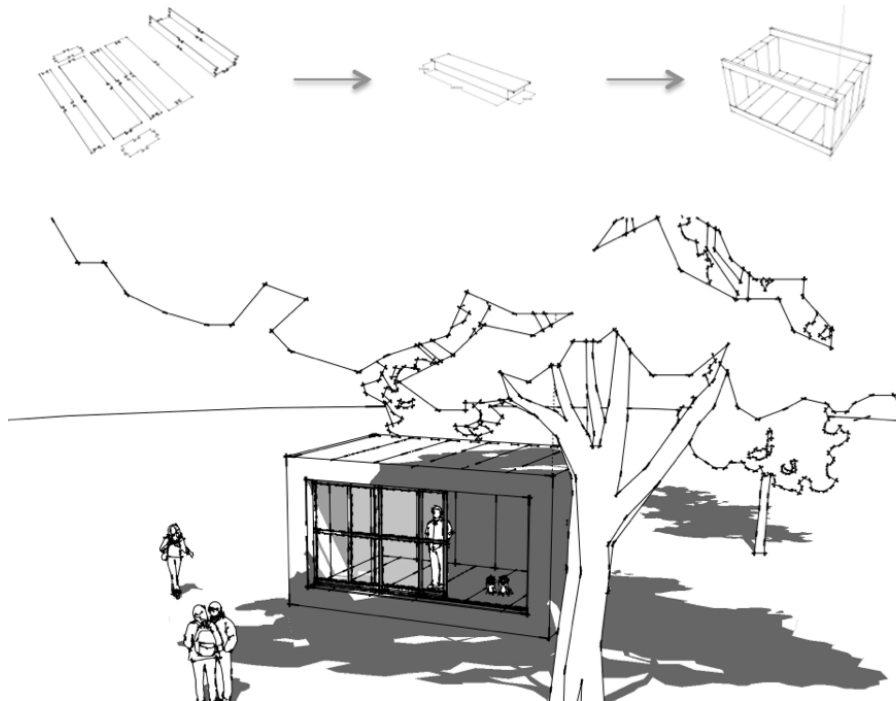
The EDFAB construction system to build a 'sleep-out,' a common addition to NZ domestic space
